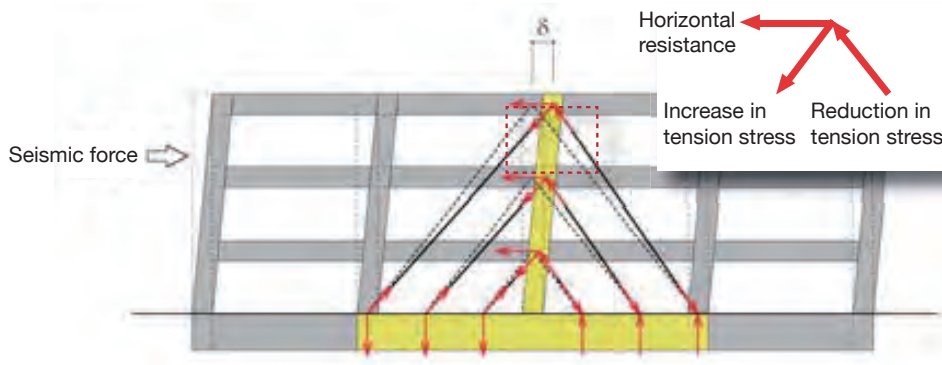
Elevation and Section of Seismic Retrofitting by Means of Parallel Structural Method
